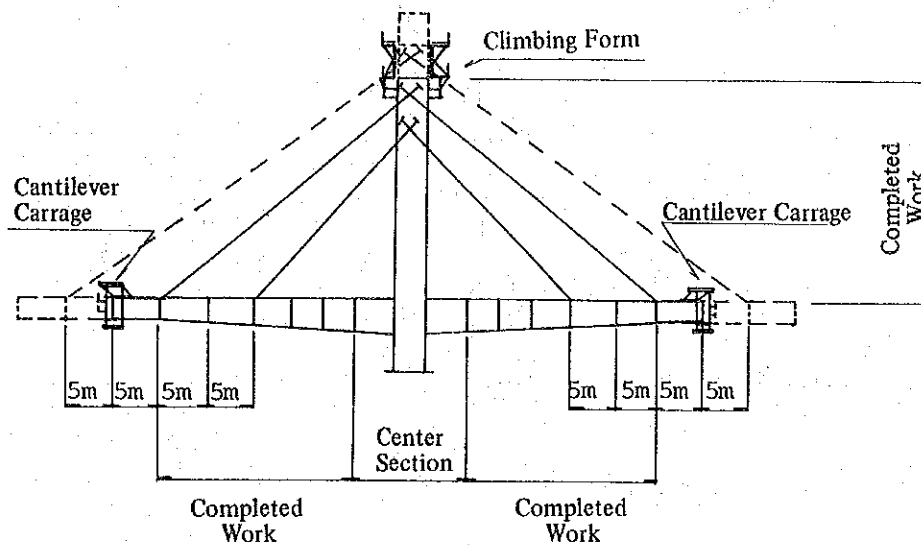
CONCEPTIONAL WORKING PLAN OF MAIN GIRDER
